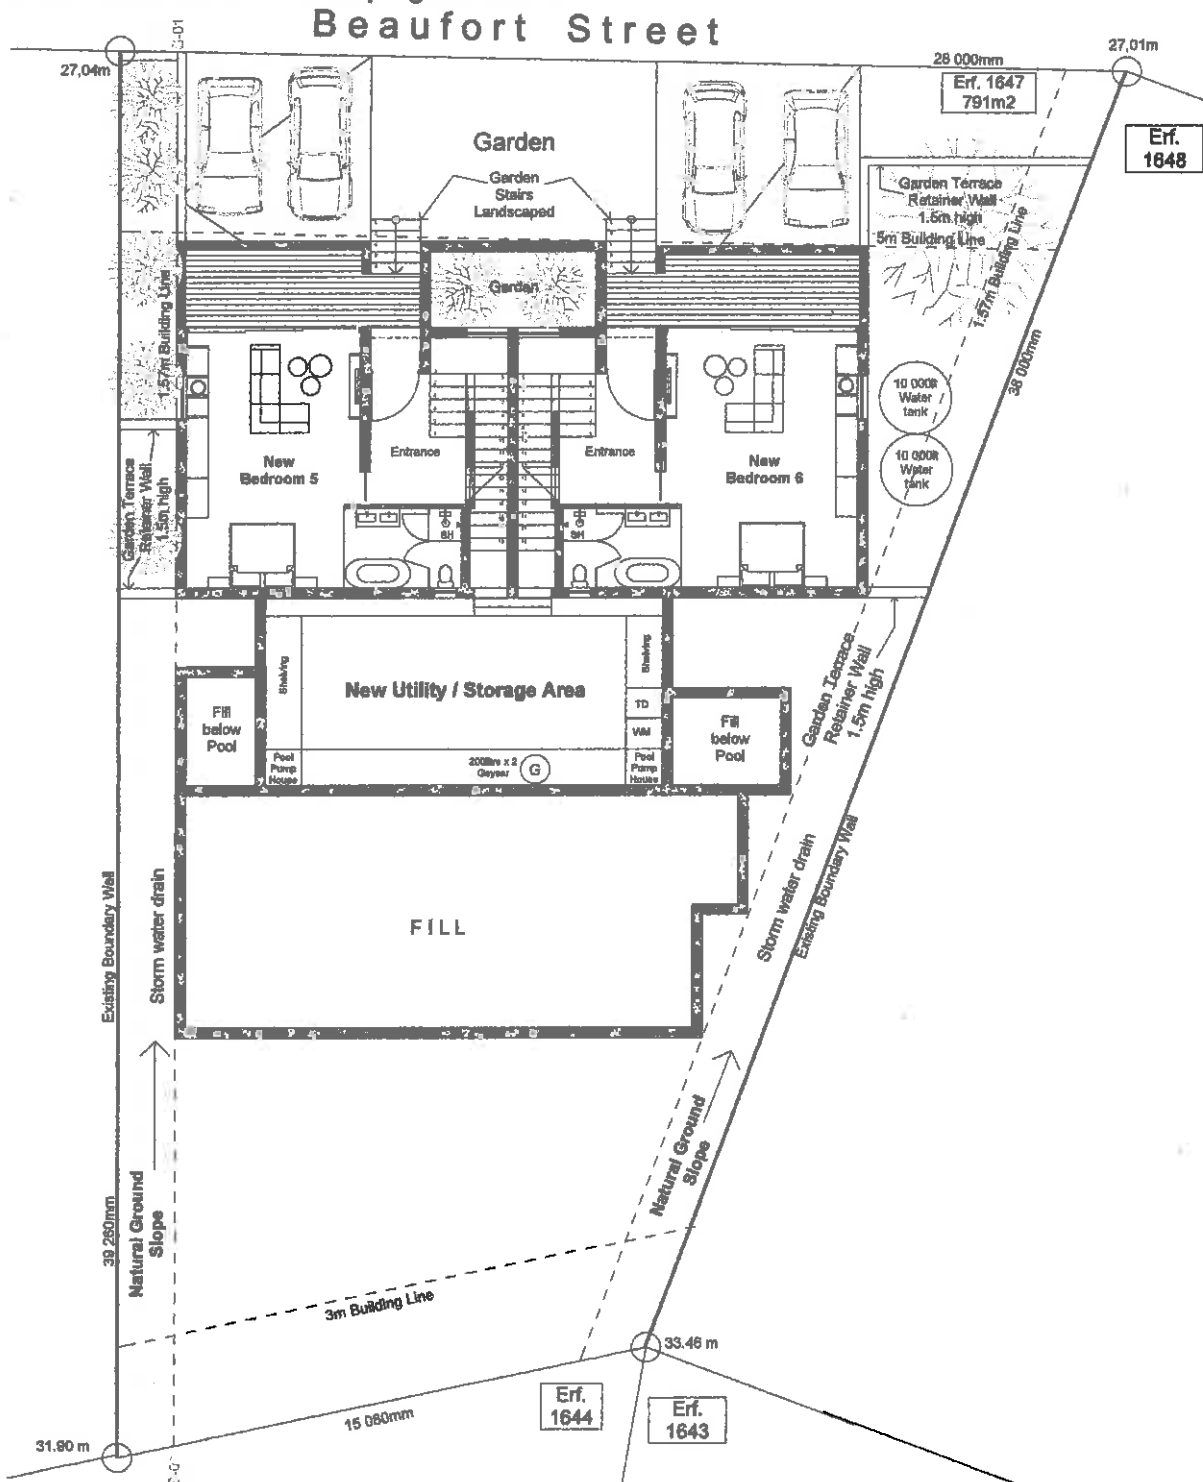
Ground floor plan (Pollos Purdon Architectural Practice)
